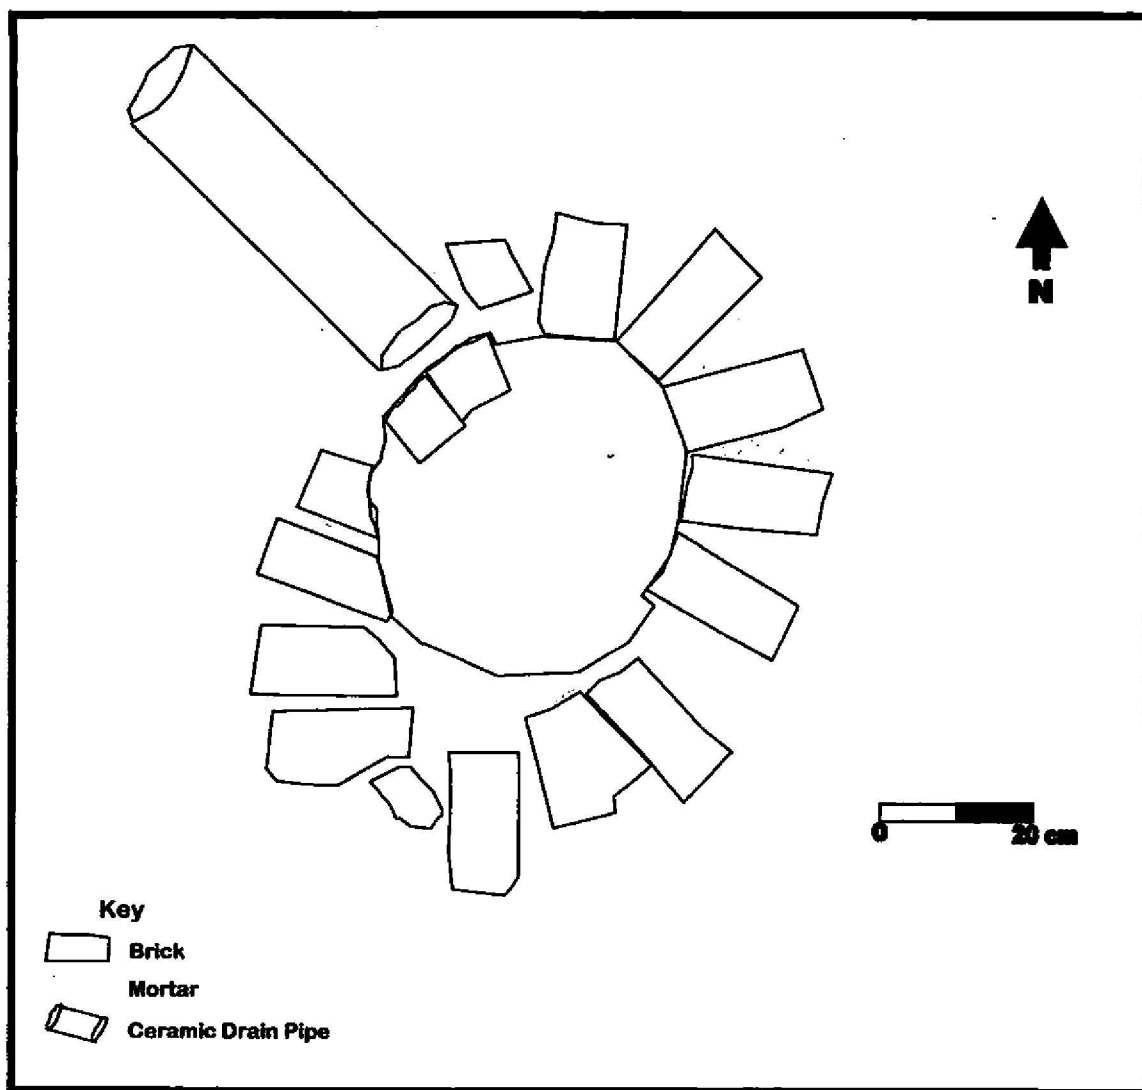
Plan of the top of the Brick Dry Well at 32 Bond Street.
